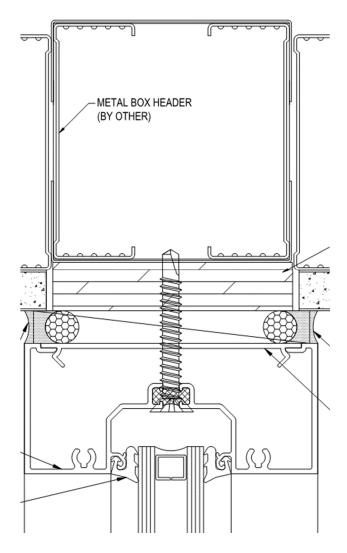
HEAD ANCHOR WITH SCREWS UNDER LARGE BENDING
